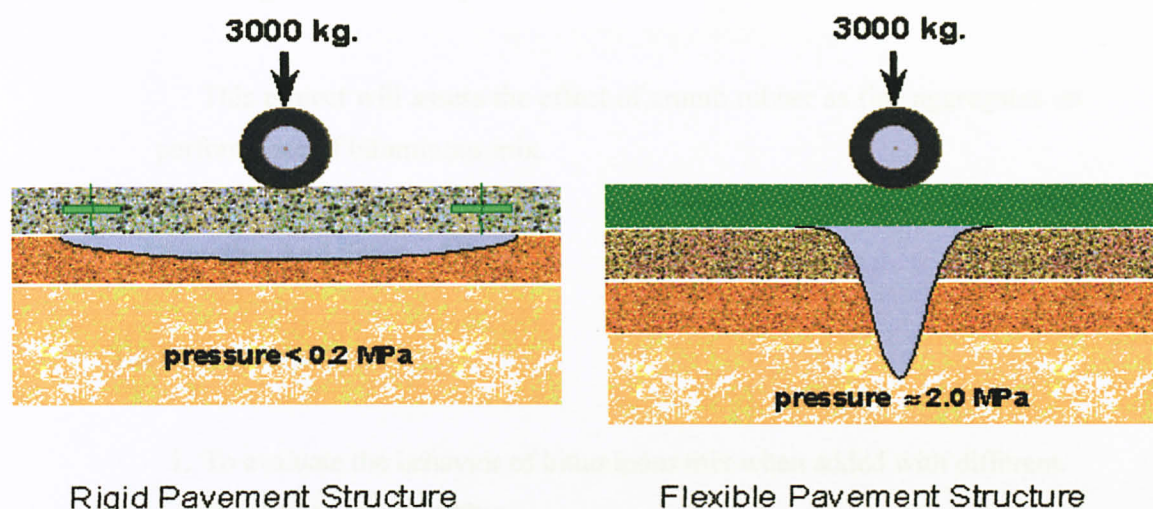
Traffic load transferred by flexible pavement and rigid pavement
